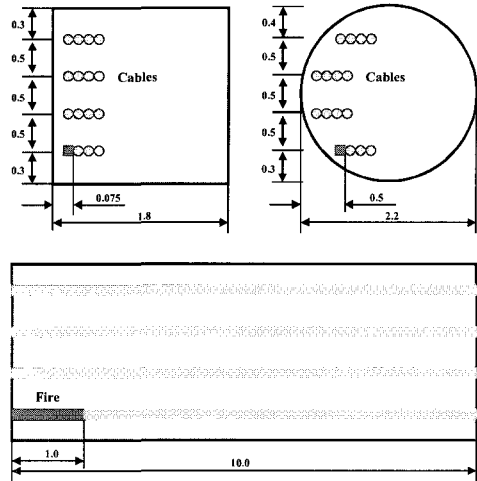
Schematic diagram of the utility tunnel systems (unit: m) (top: cross-sectional view of rectangular and circular tunnels; bottom: longitudinal view).
